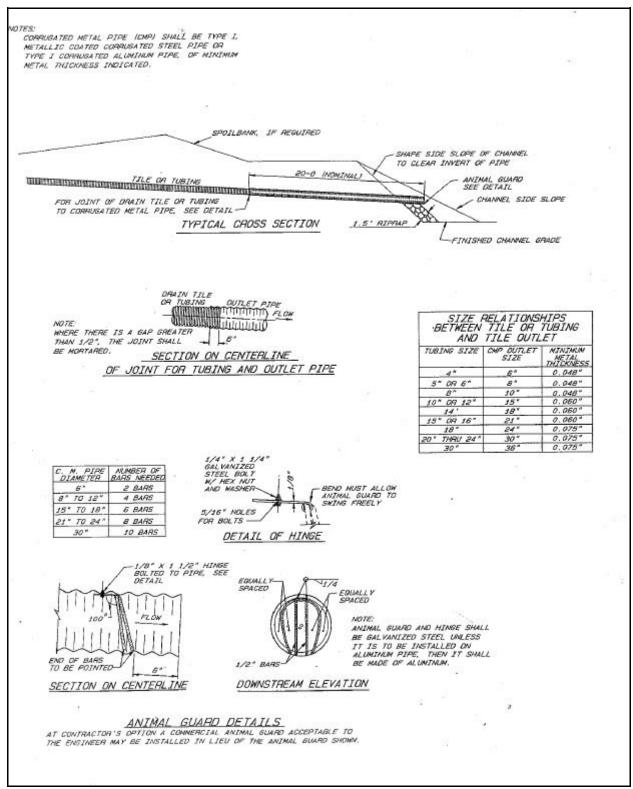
Typical Specifications for Pipe Outlet Extension (Source: NRCS Files)
